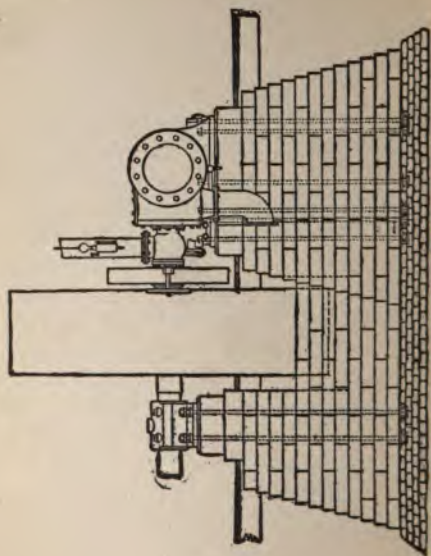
FRONT ELEVATION, TANGYE PATTERN, BUCKEYE ENGINE.
